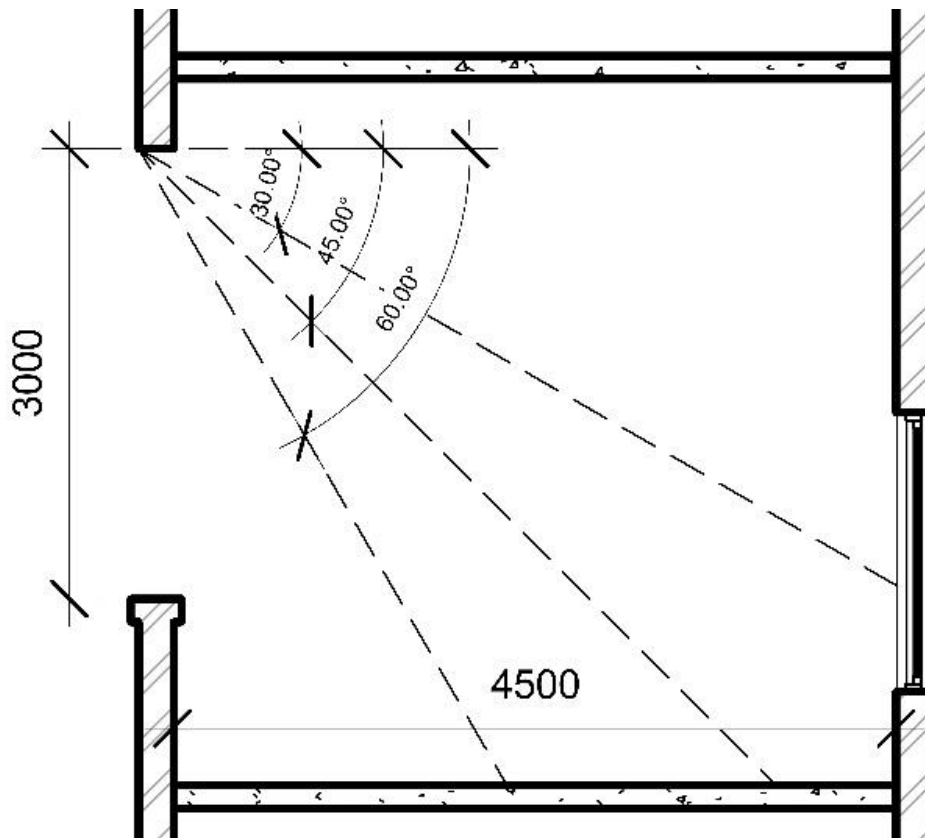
The section through the walkway of Faith tabernacle and sunlight angles. (Source: Author's fieldwork)
